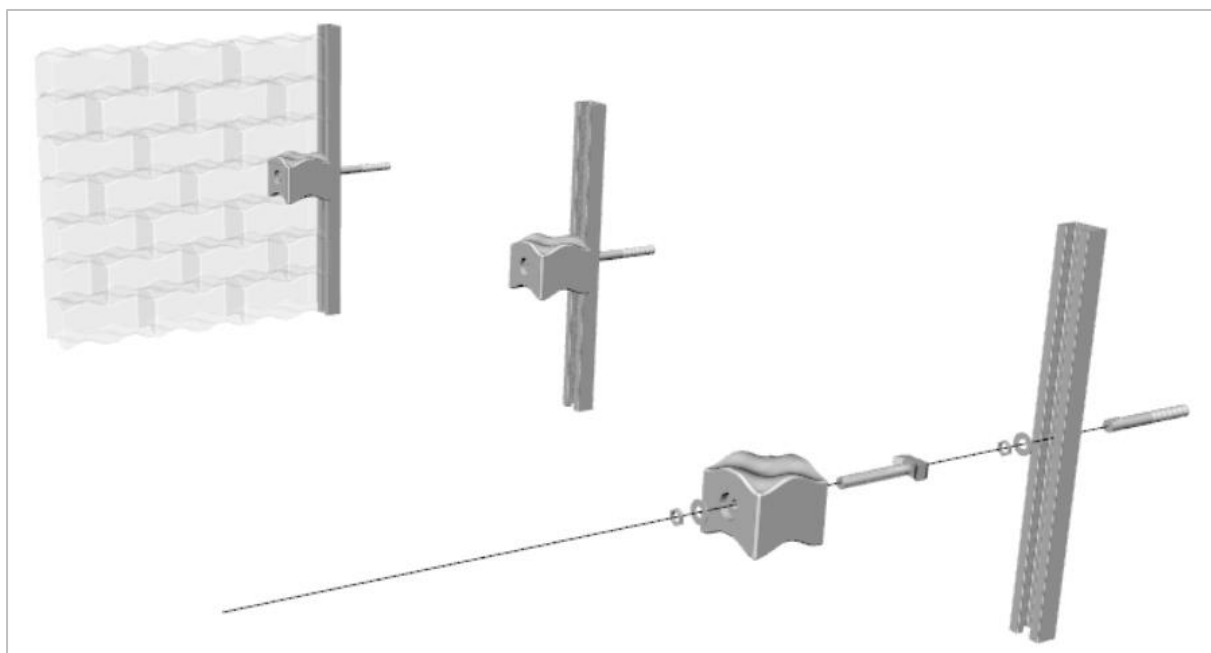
Aluminium half-brick fixing principle in exploded view and after fixing.
